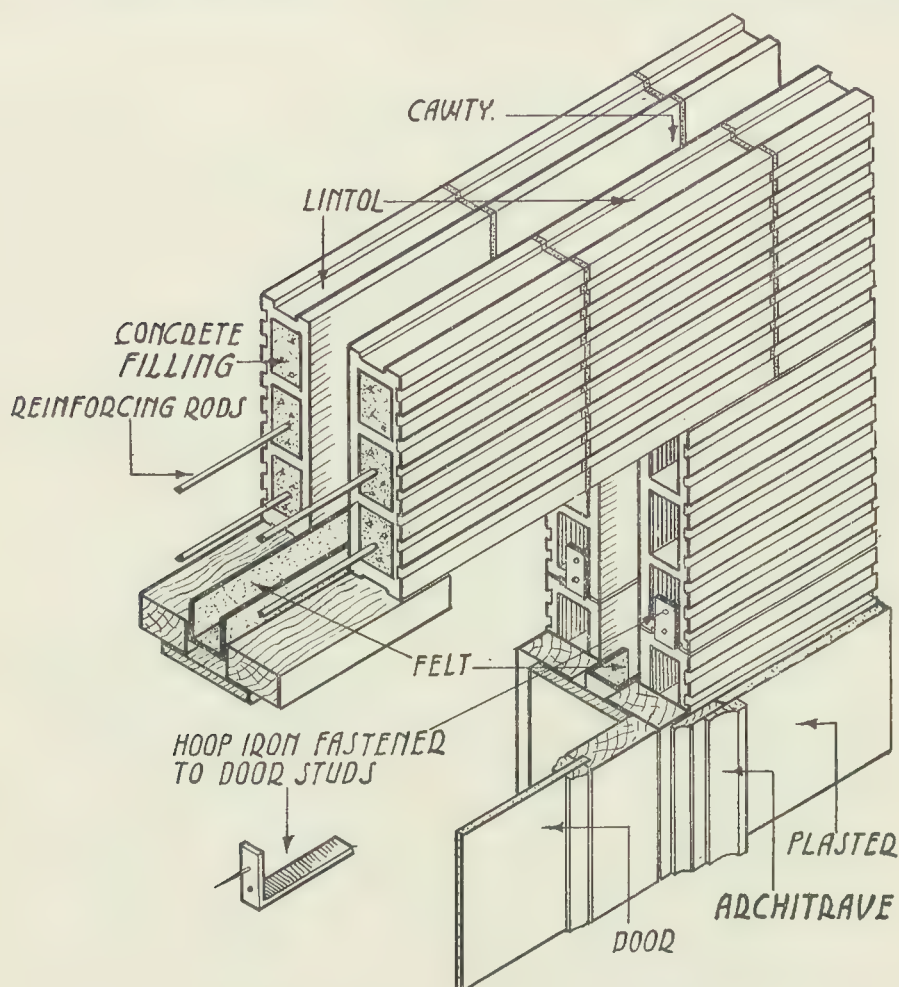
CONSTRUCTION OF CAVITY HOLLOW BLOCK PARTITION WALL
